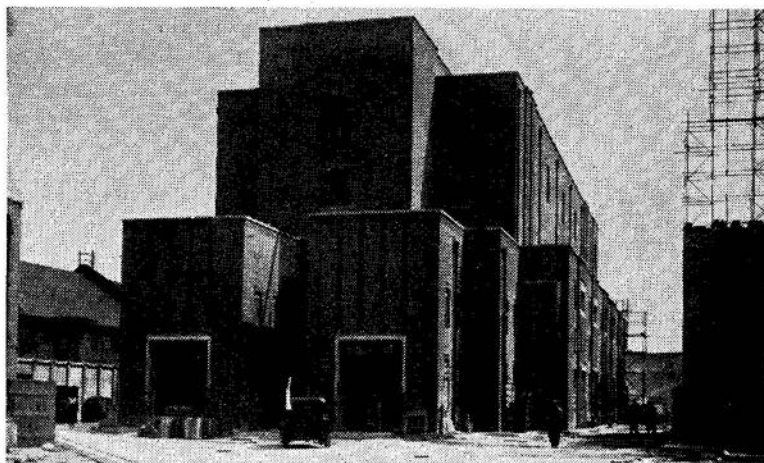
132-kV switchhouse as installed at Brunswick Wharf, Polar, London
